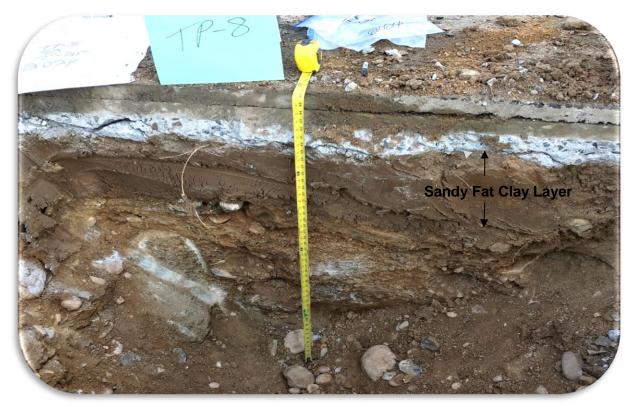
Trench sidewall at Test Pit TP-8 (Taylor Street). Note pavement overlying concrete.
